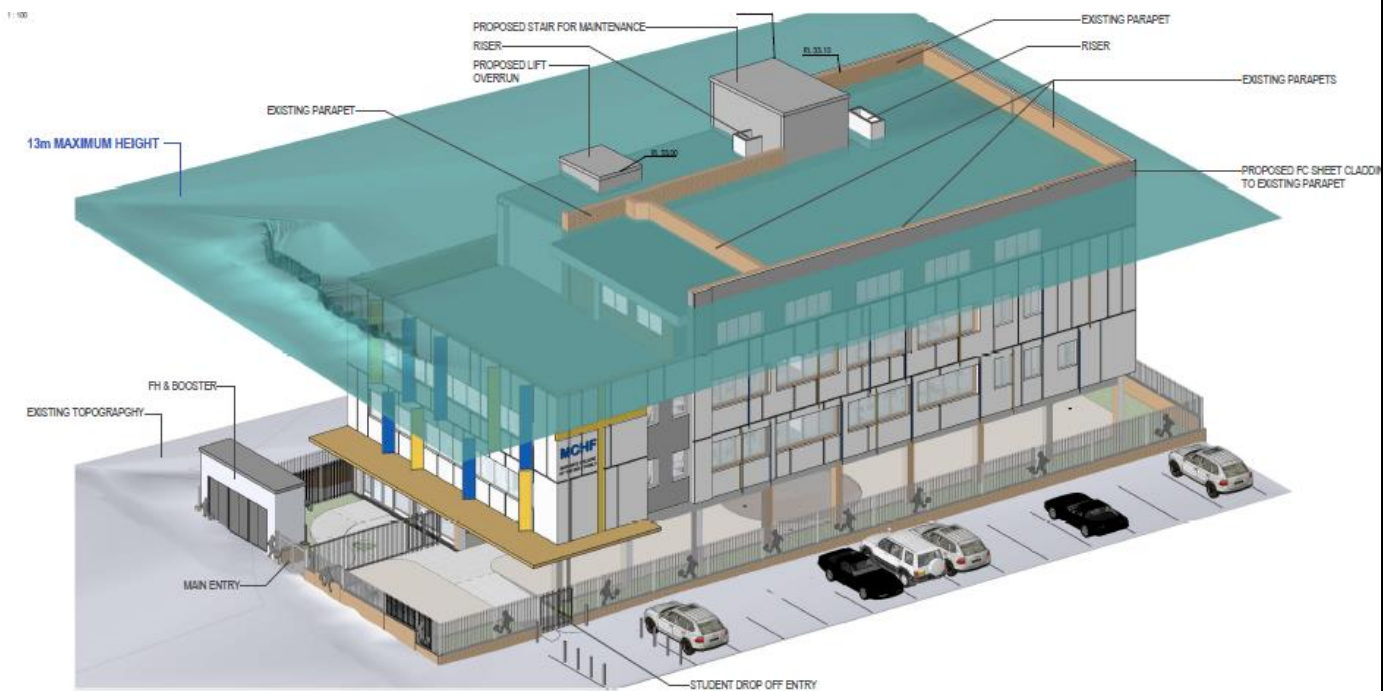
3D Plane study of the proposed building, showing the extent of non-compliance. The grey areas are the new lift and stair overrun whilst the brown area show that the existing building has parapets already exceed the height control.
